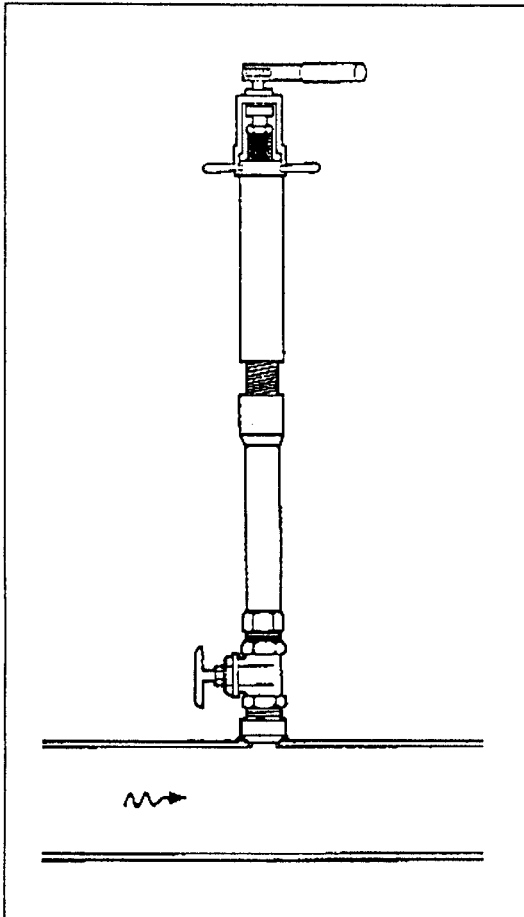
drilling machine with flanged adapter nipple mounded on unit isolating valve
